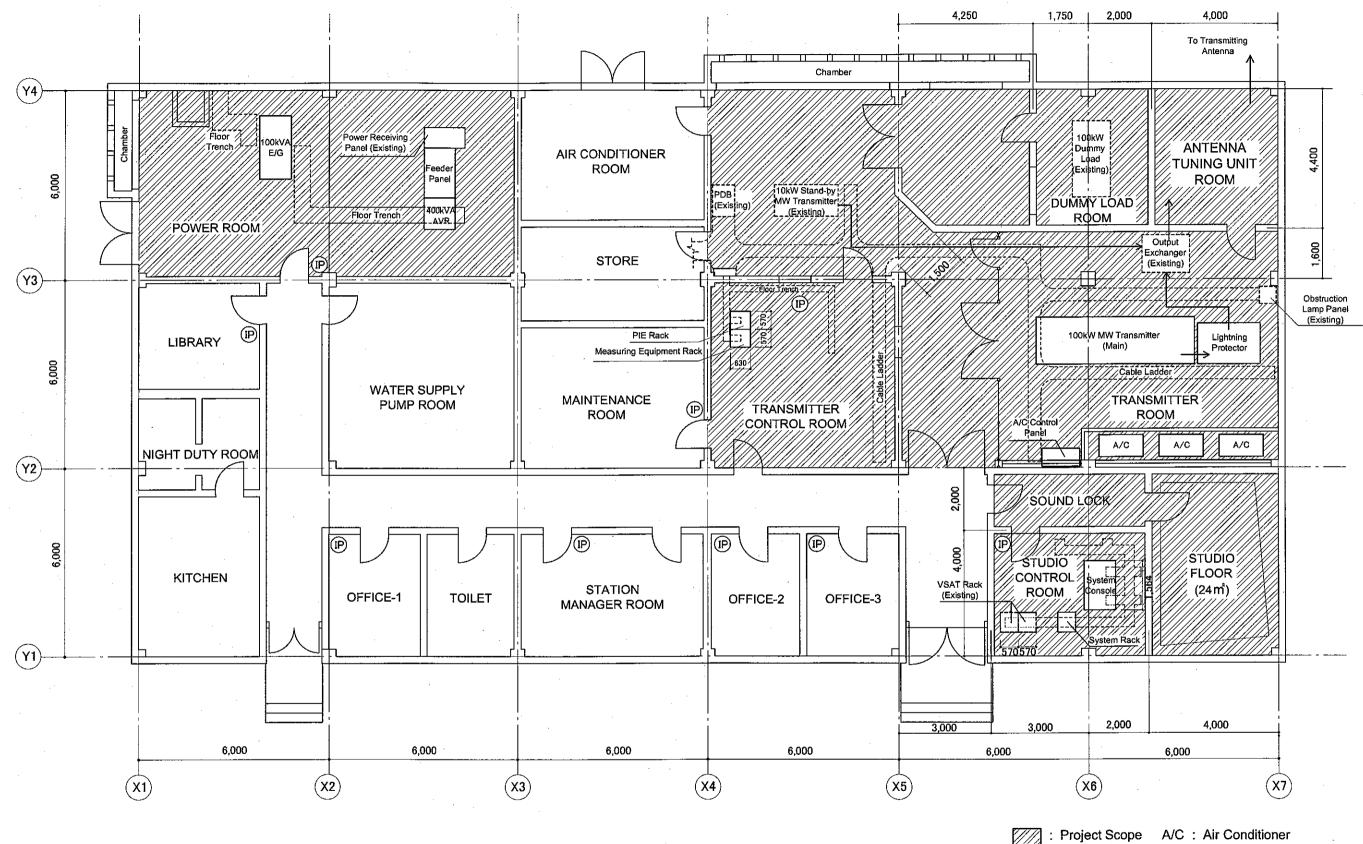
POKHARA 100kW MW TRANSMITTING STATION EQUIPMENT LAYOUT
